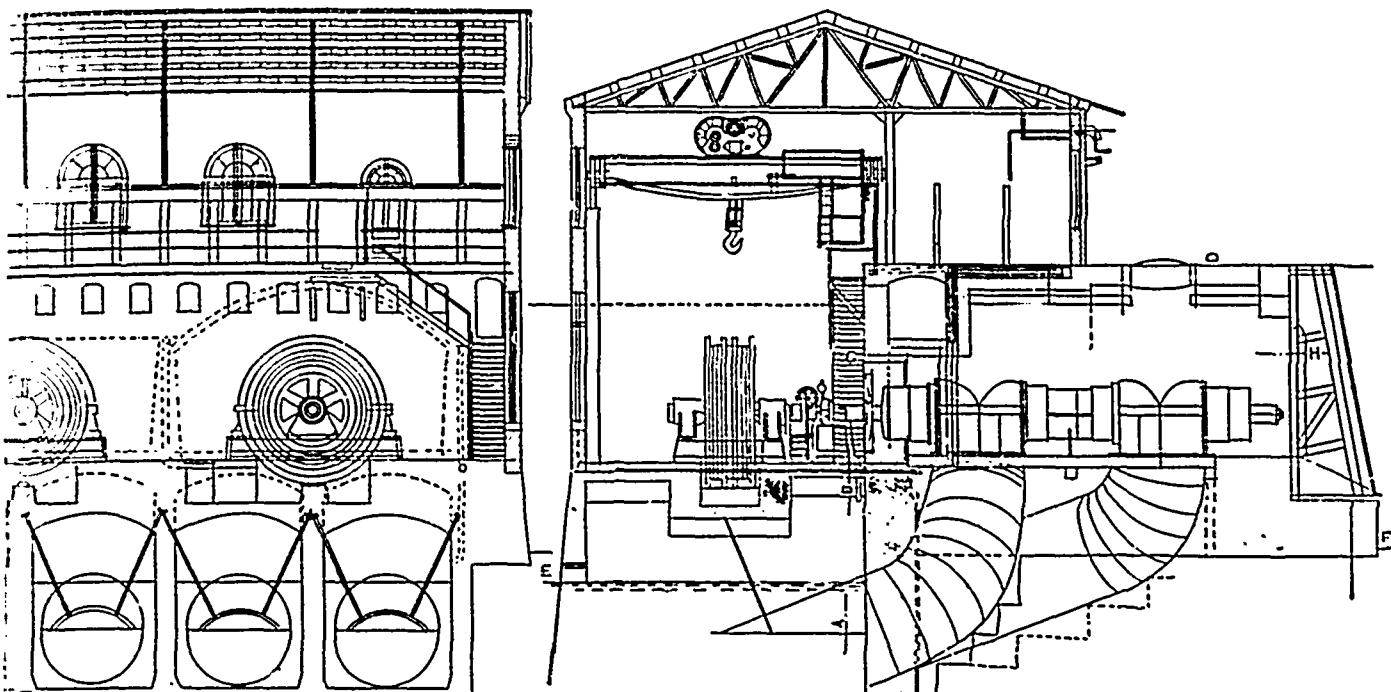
SECTIONAL ELEVATIONS THROUGH WHEELS AND POWER HOUSE.
